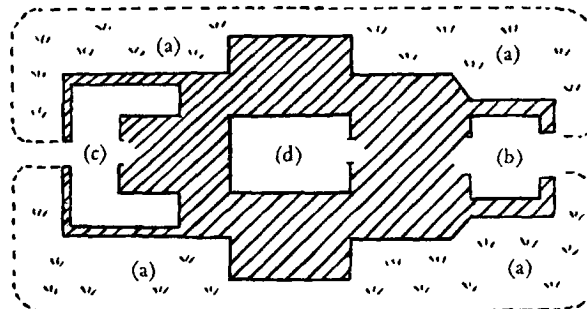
Floor plan of house (a) Garden; (b) Court; (c) Yard; (d) Quadrangle
